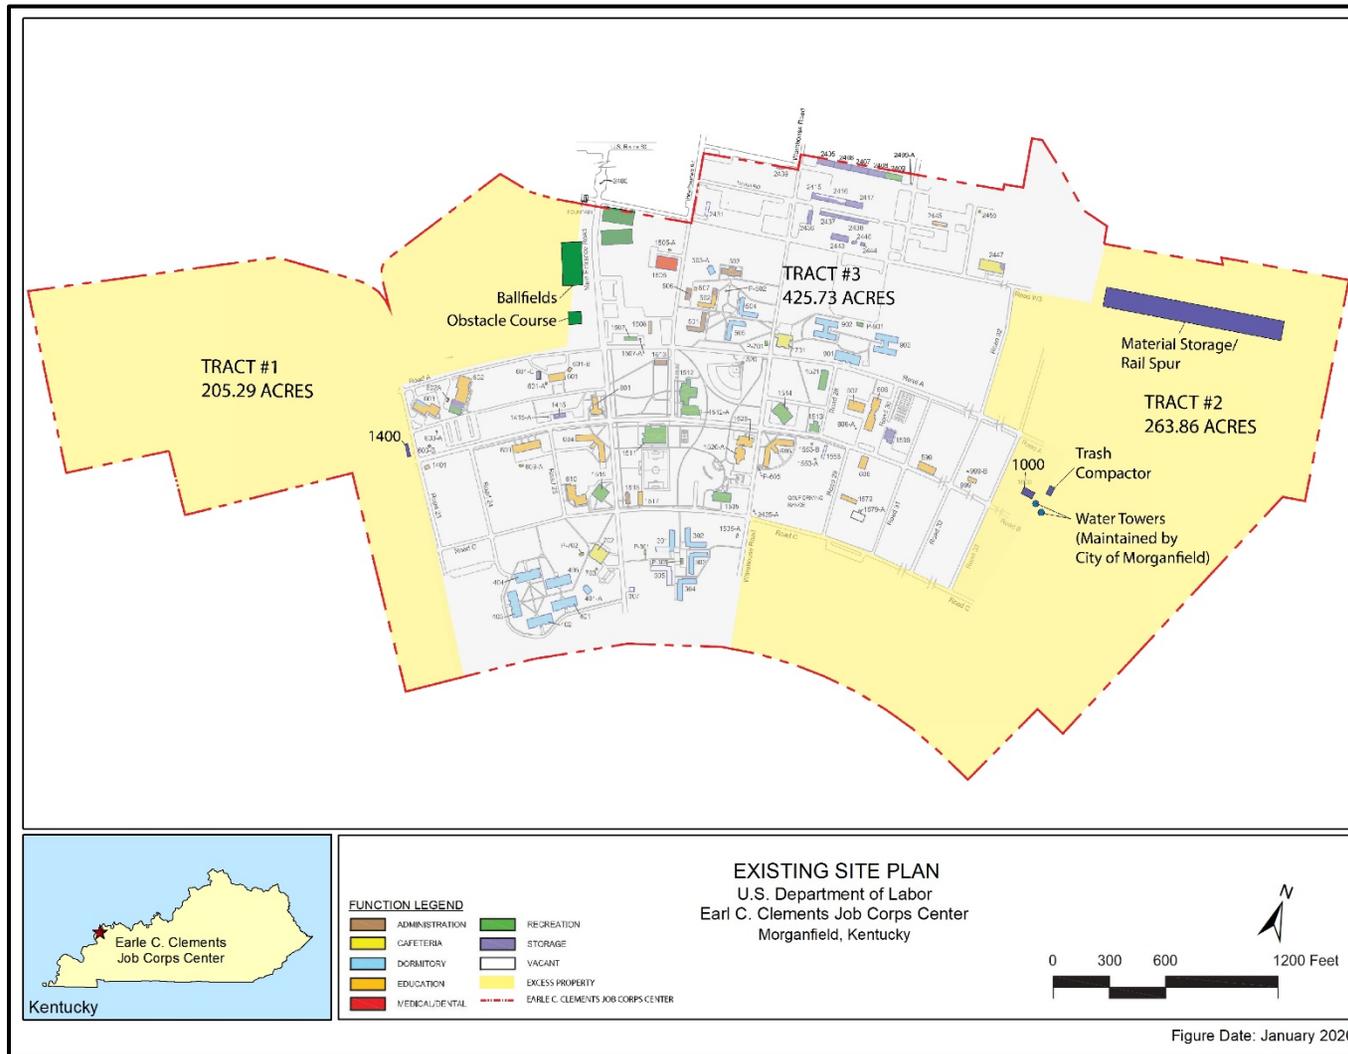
Earle C. Clements Job Corps Center Existing Site Plan (DOL 2017a)
